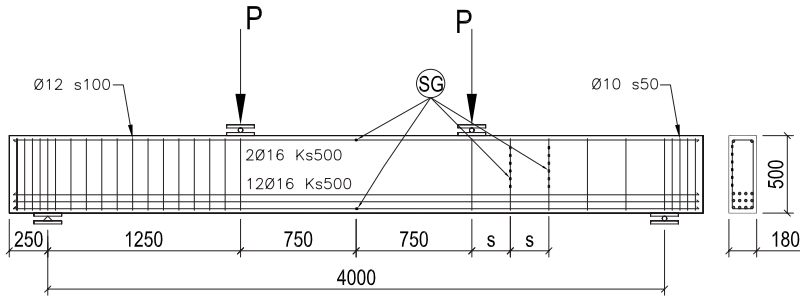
Four-point beam bending test setup, geometry, and reinforcement scheme
